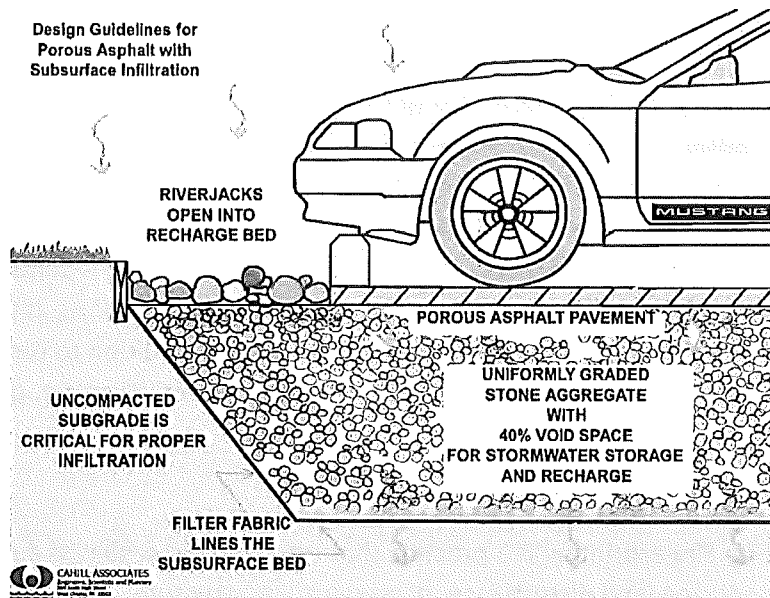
Diagram of the use of porous asphalt pavement in a parking lot.
